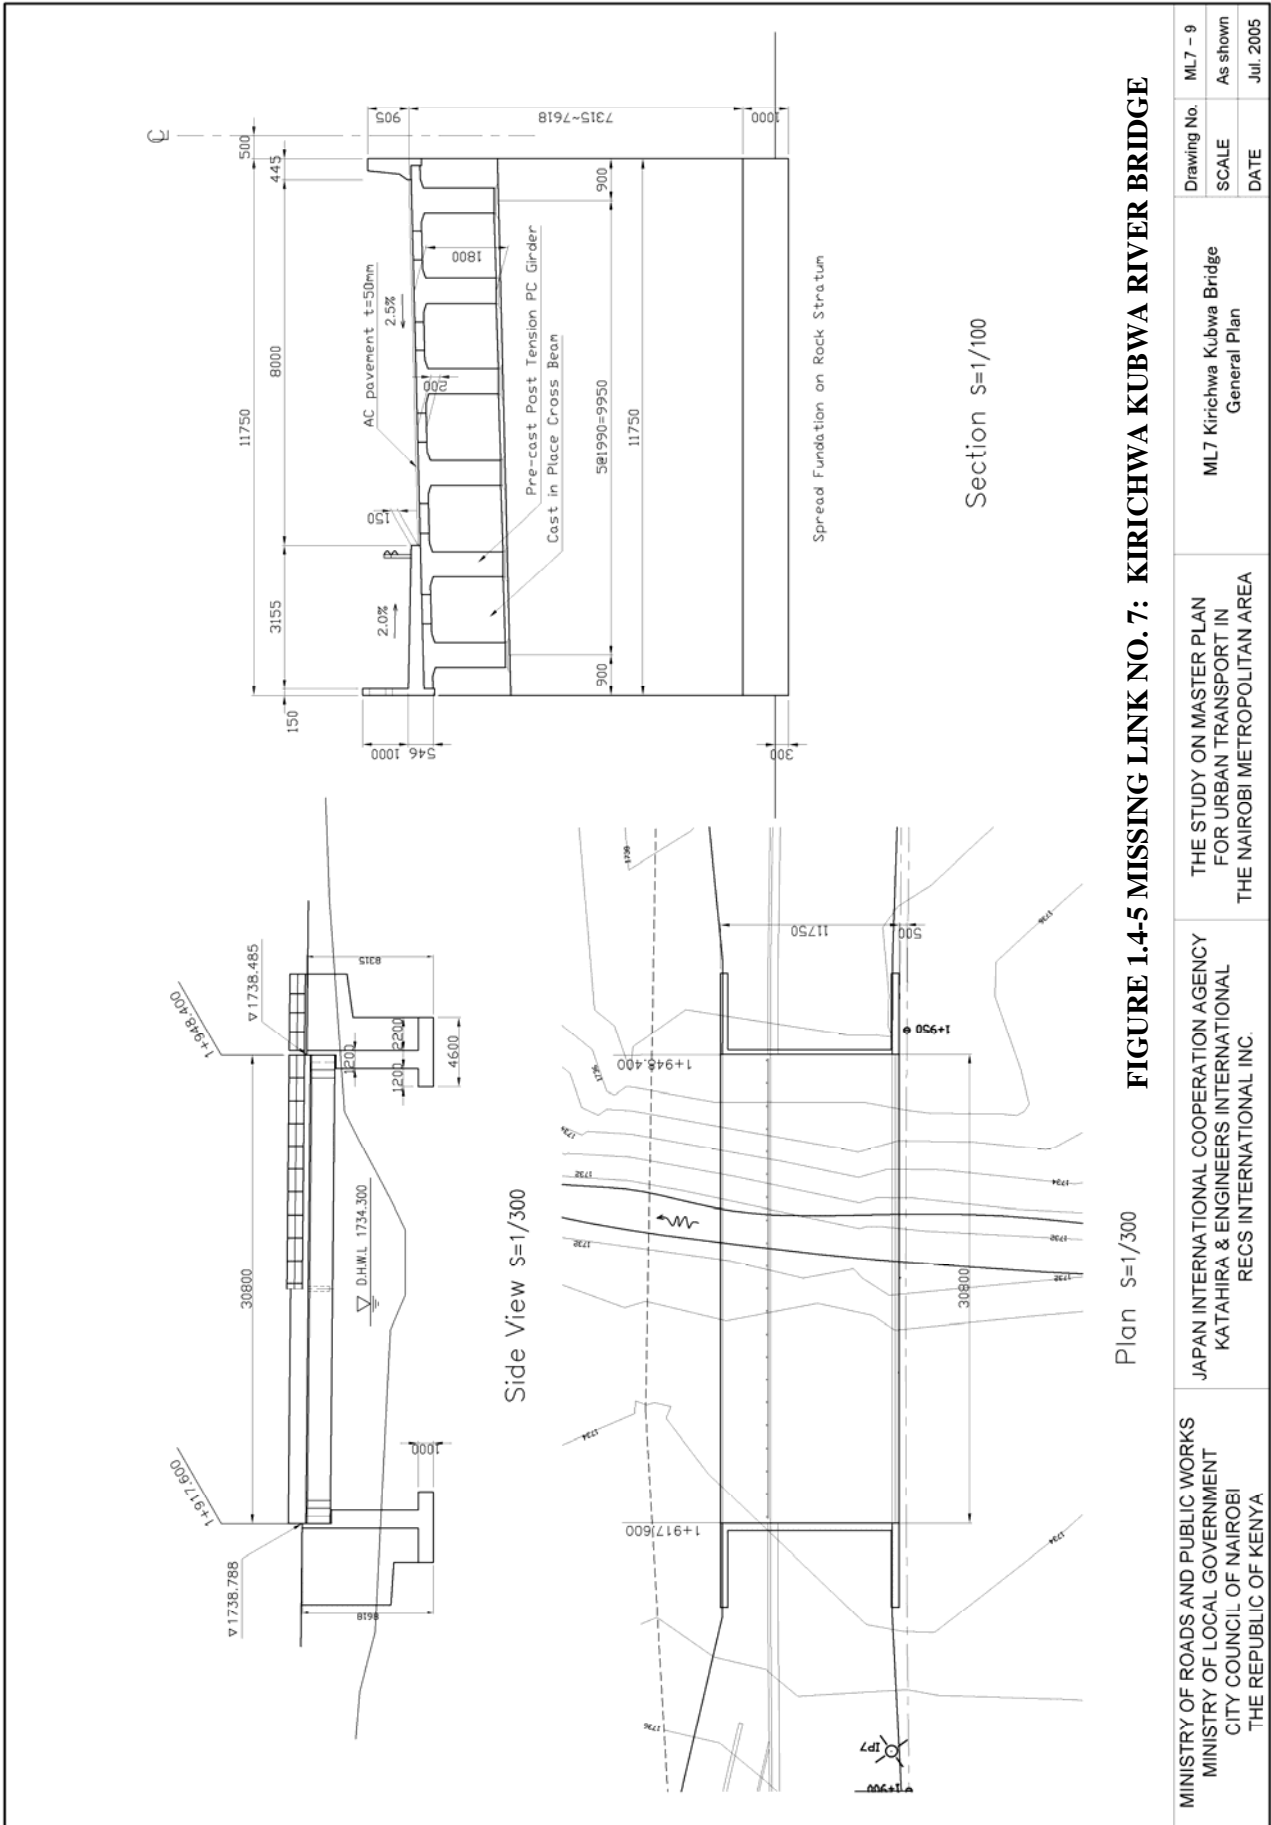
MISSING LINK NO. 7: KIRICHWA KUBWA RIVER BRIDGE
